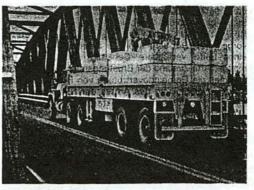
Load testing the rehabilitated Sioux Narrows Bridge.
